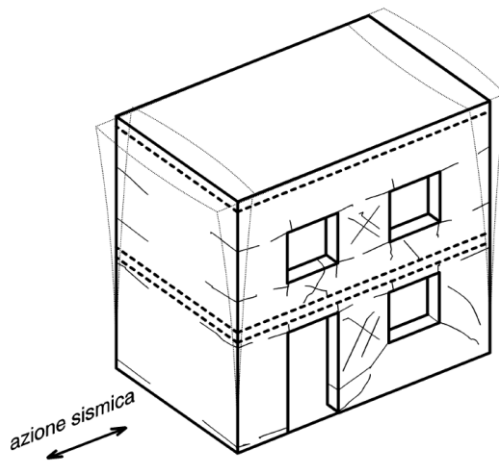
Seismic response of masonry building, in which tie-beams, ties and rigid floors inhibit out-of-plane flexural failures (from Macchi and Magenes 2002).
